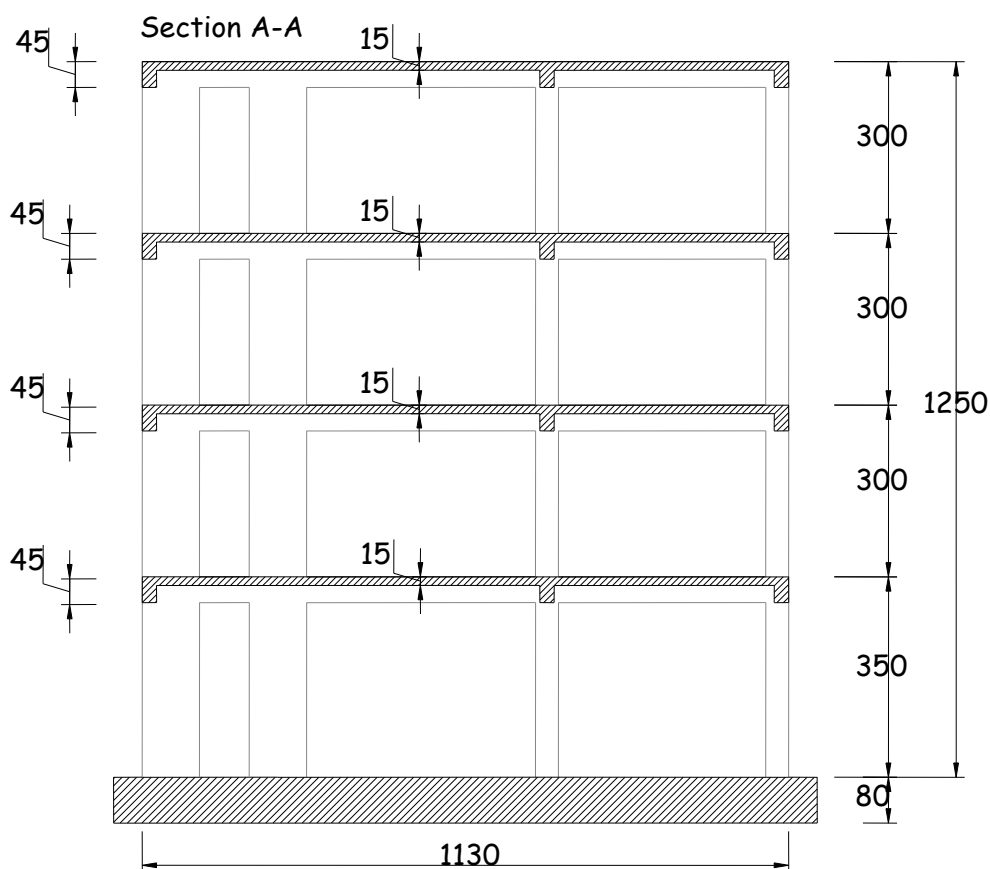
Elevation view of the “dual frame” building (measures in cm).
